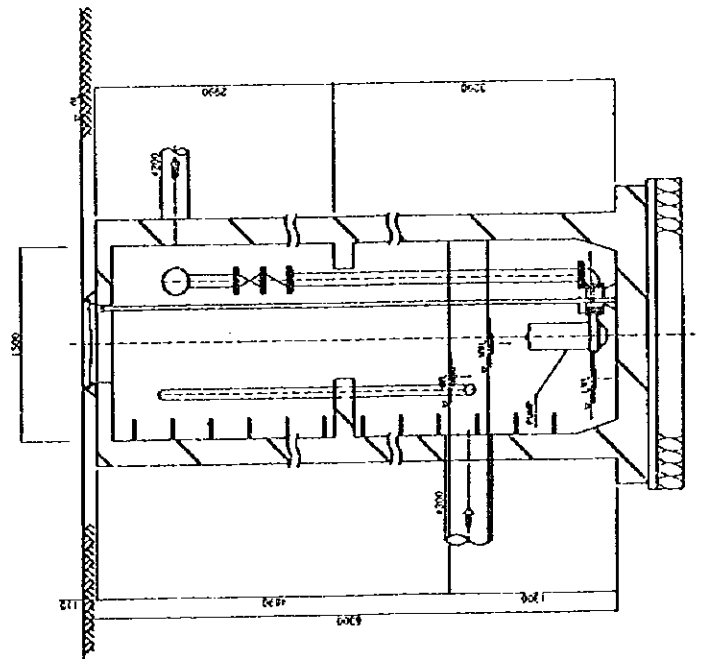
Standard Drawing of Manhole Type Pump Station
